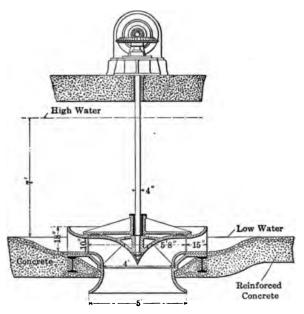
Section Showing the Combination of Screw and Volute Centrifugal Pump.
